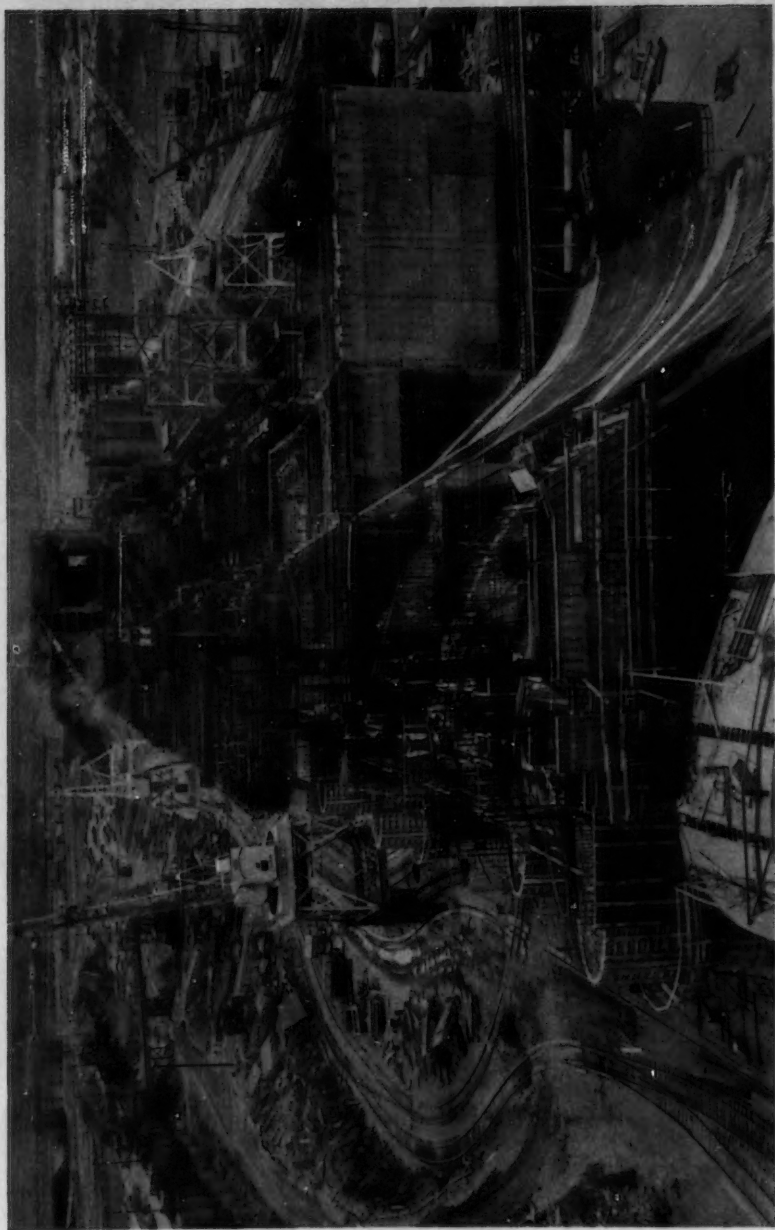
Work under way on powerhouse and spillway of third and final phase of construction.
